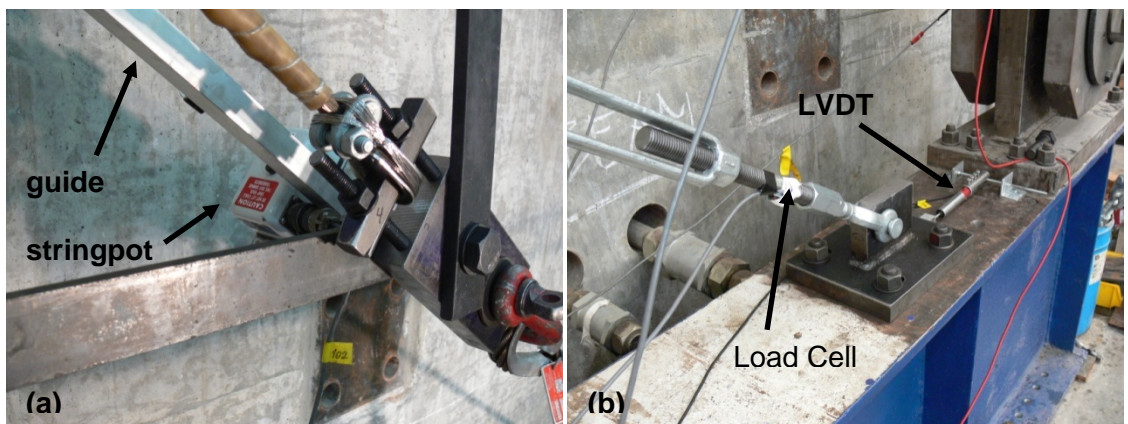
Instrumentation details for (a) the AQ and (b) the cable assembly.
